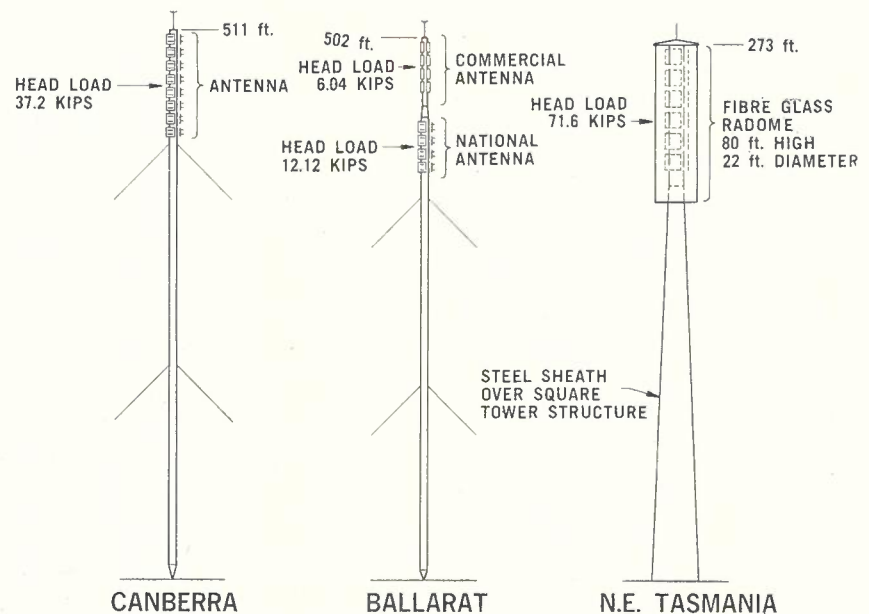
Heights and Head Loadings of Typical Aerial Support Structures.
